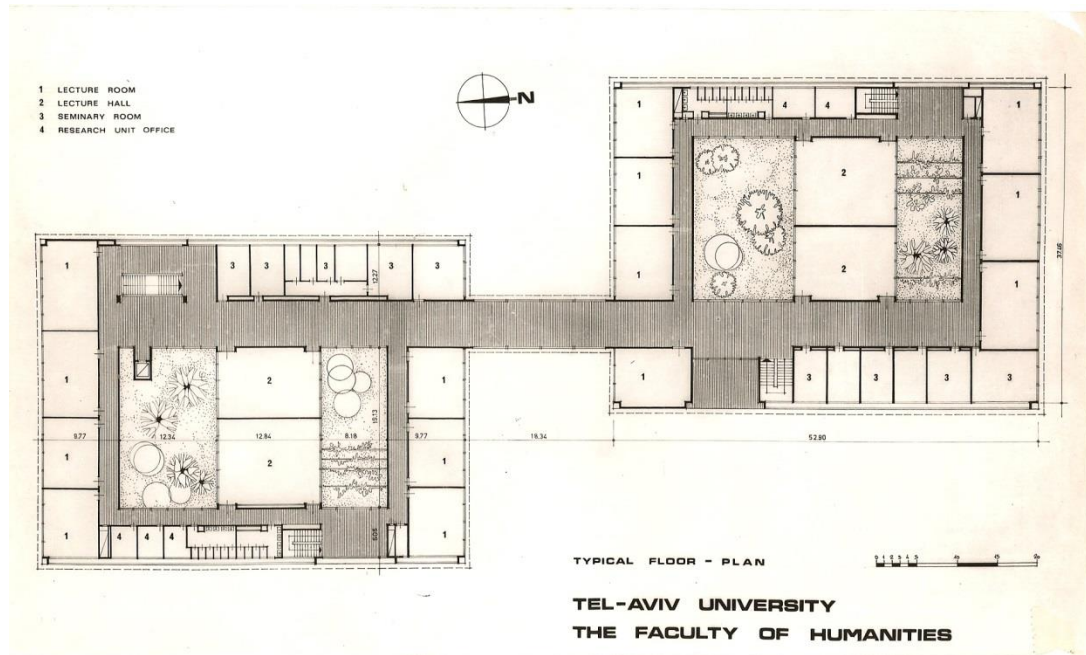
Typical floor plan of the Gilman building, a presentation plan, 1963 (Israel Stein Collection)
